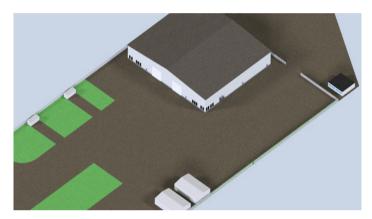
LVIB with dry storage buildings in the bottom of image.
